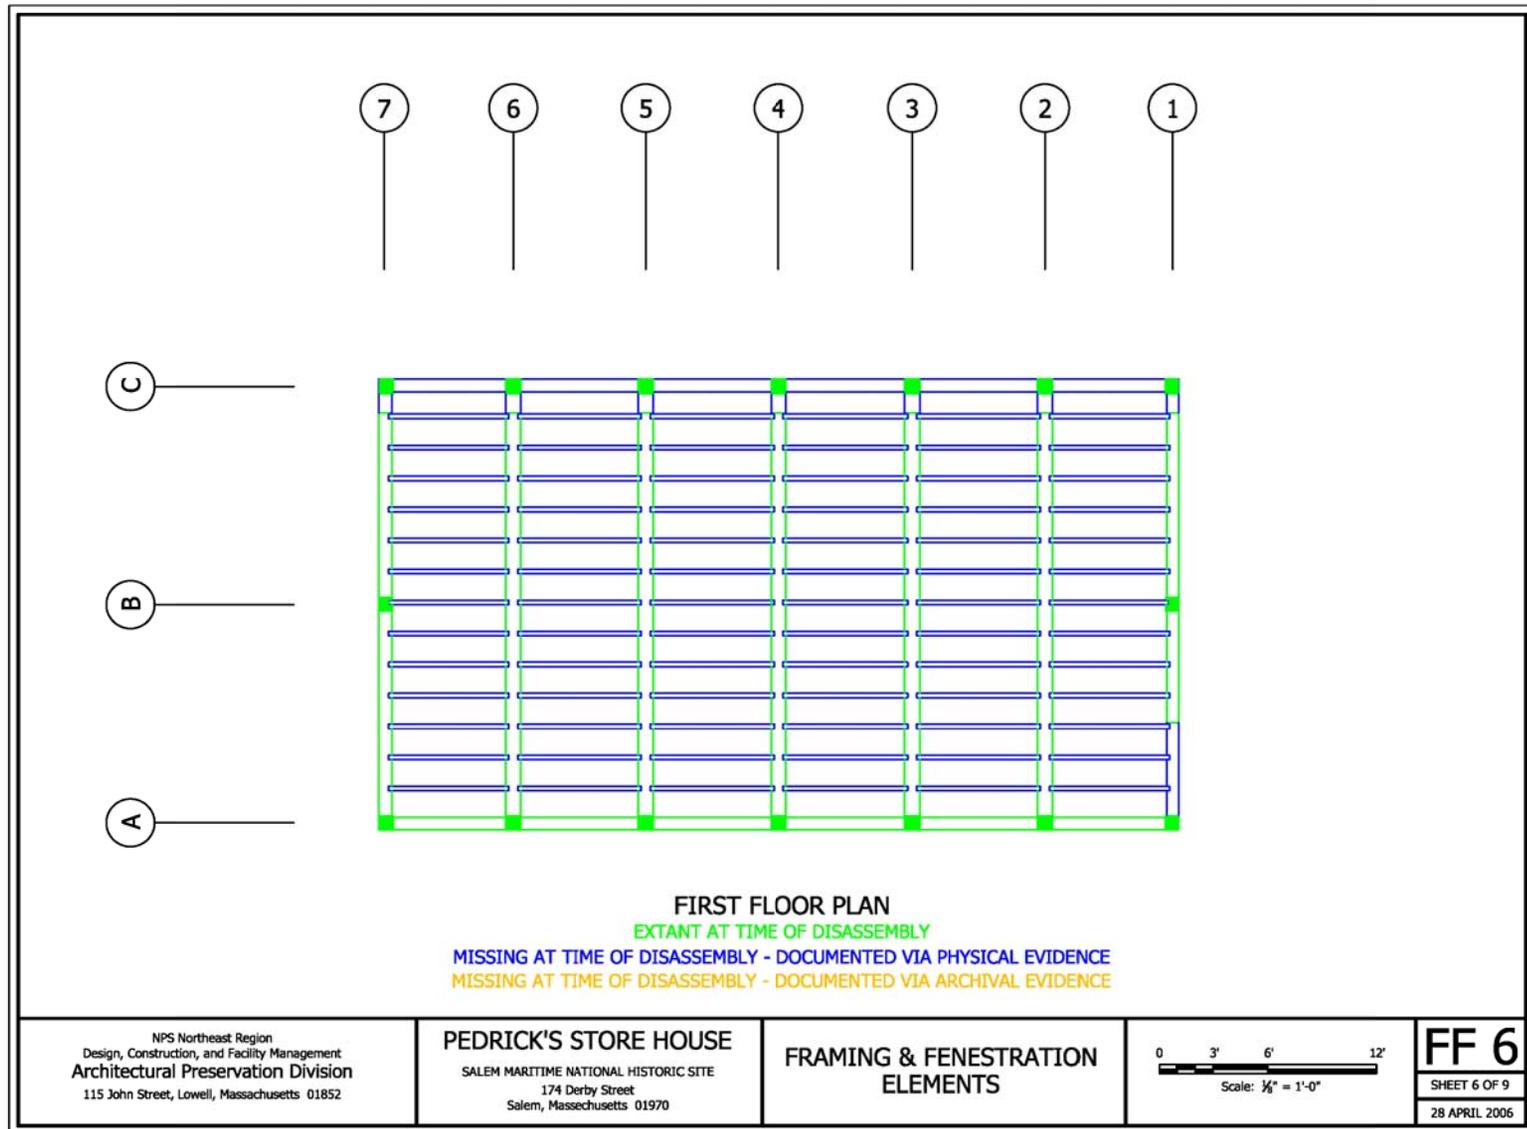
Measured drawing of framing and fenestration elements: First-floor plan.
